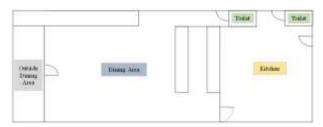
Floor Layout of Richiamo Simpang Renggam
